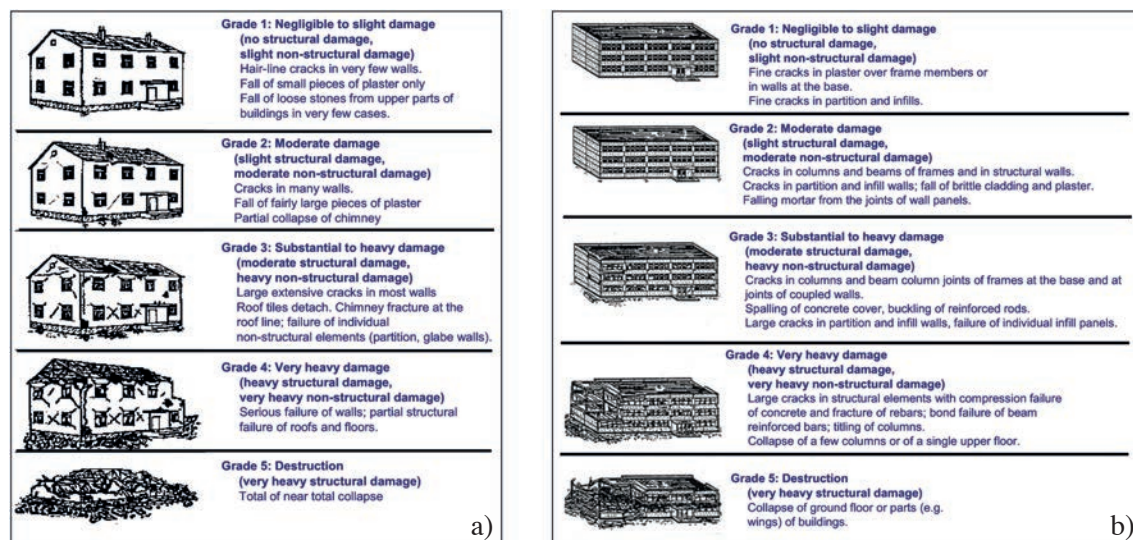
EMS'98 scale damage levels (Grünthal, 1998) for masonry (a) and reinforced concrete (b).
